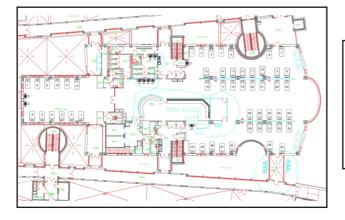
Detailed so-called "Escalation Plans" have been made by our engineers so as to prepare sites where extra beds can fit. This demonstrates the staff canteen layout which is shown in figure 2 of this photo-essay.
